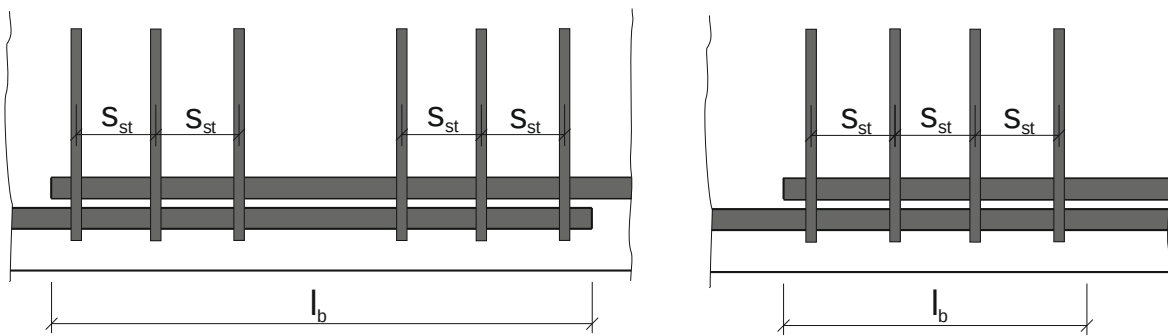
Recommended transverse reinforcement distribution for long anchorage lengths, e.g. in laps (left) and for short anchorage lengths (right)
